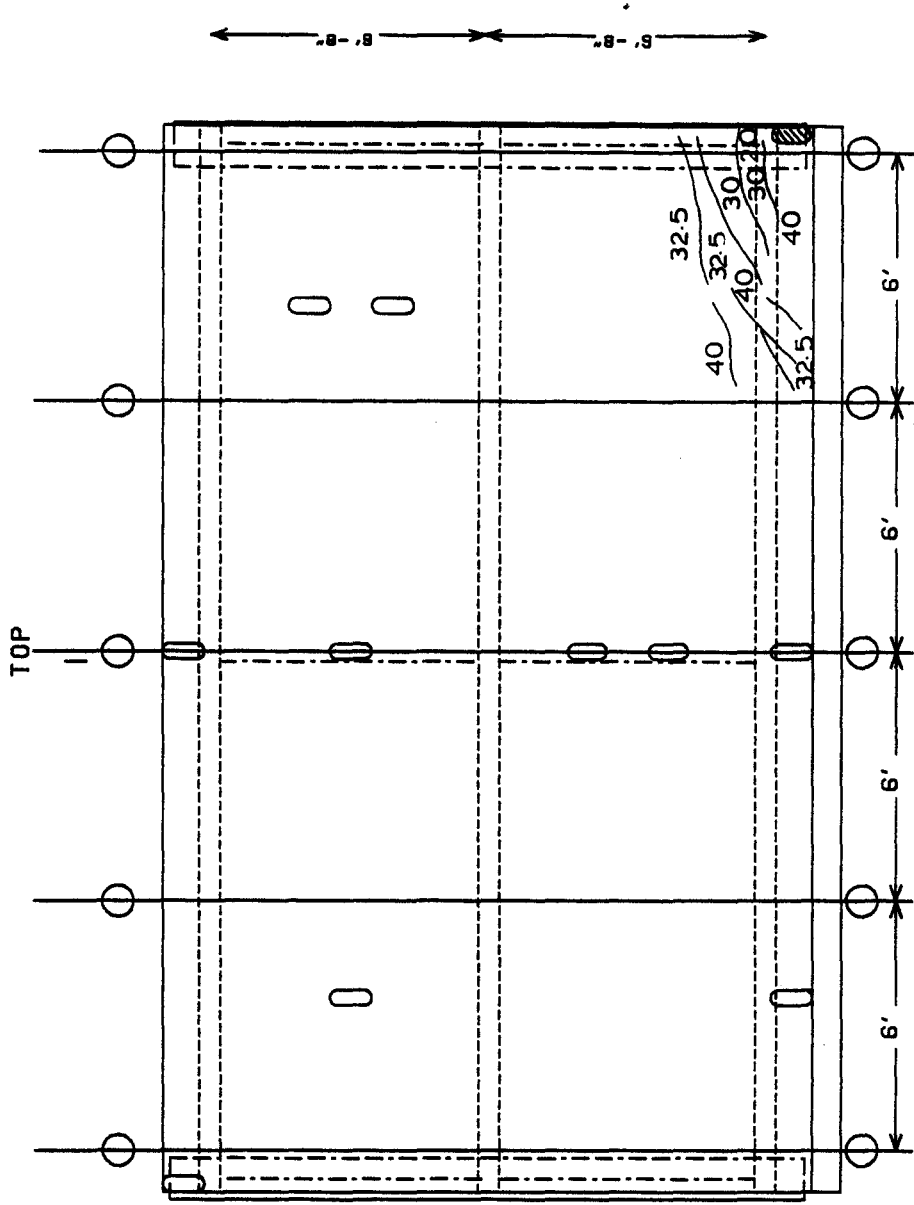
Top Cracking Pattern (First Bridge - Test No. 6)
